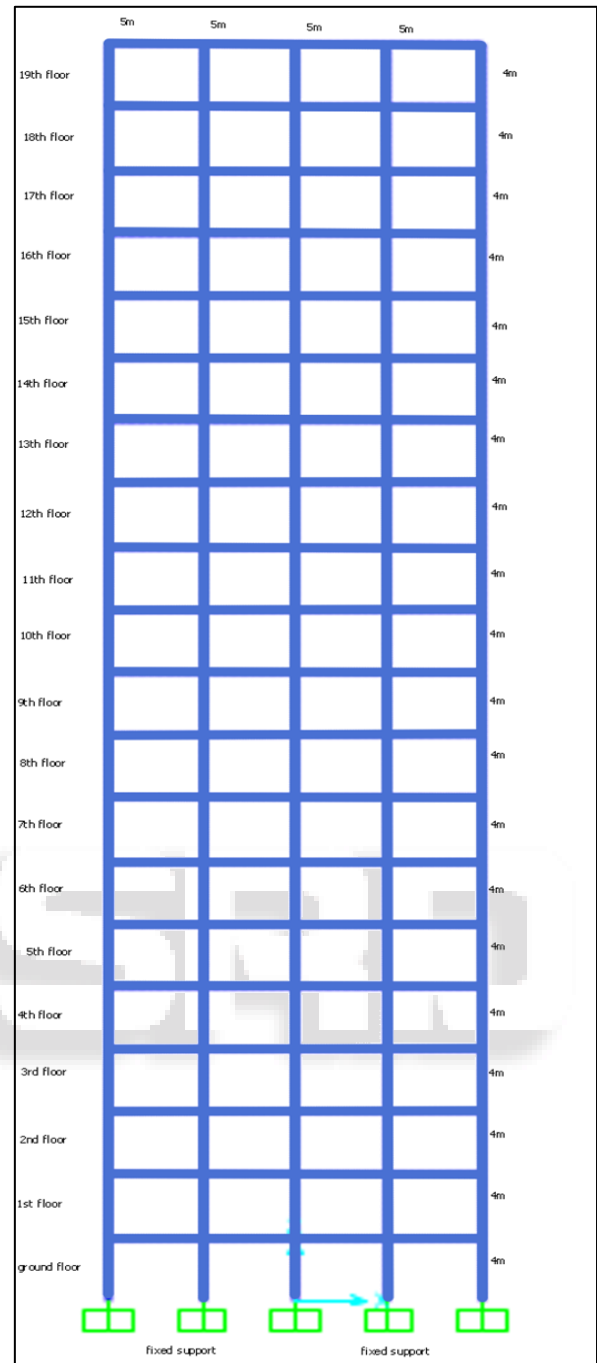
elevation plane of 2d 20 storey structure for second case of with shear wall all structure is created as above mentioned process first then shear wall is provided at the middle two bays throughout the height of the frame and assigned diaphragm to it and the cut section is defined at the base level of the structure then model is created the elevation plane is shown below.
